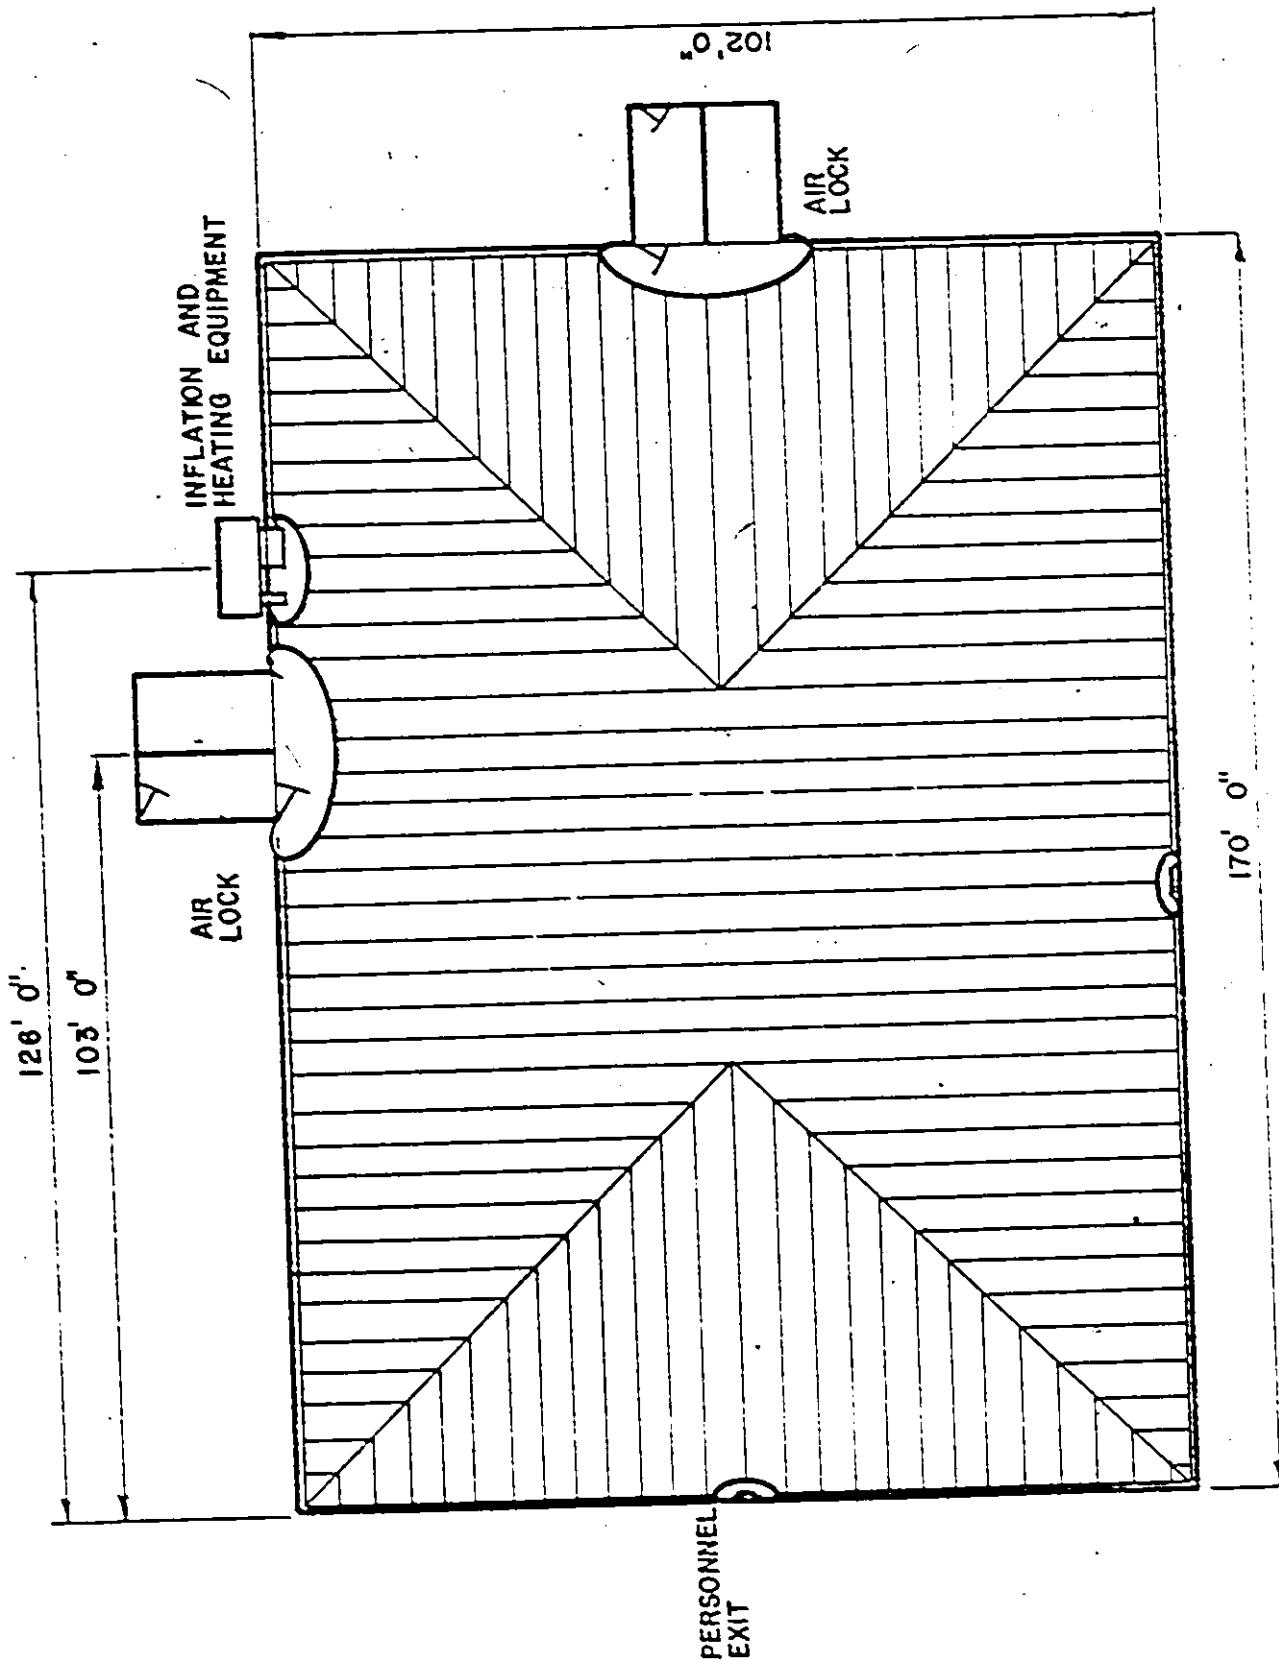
(i) DIMENSIONS OF WAREHOUSE INSTALLATION.
